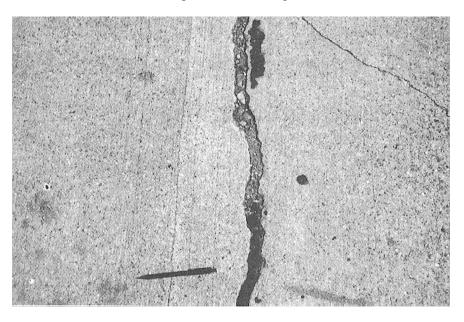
Joint seal damage, incompressibles in joint.
